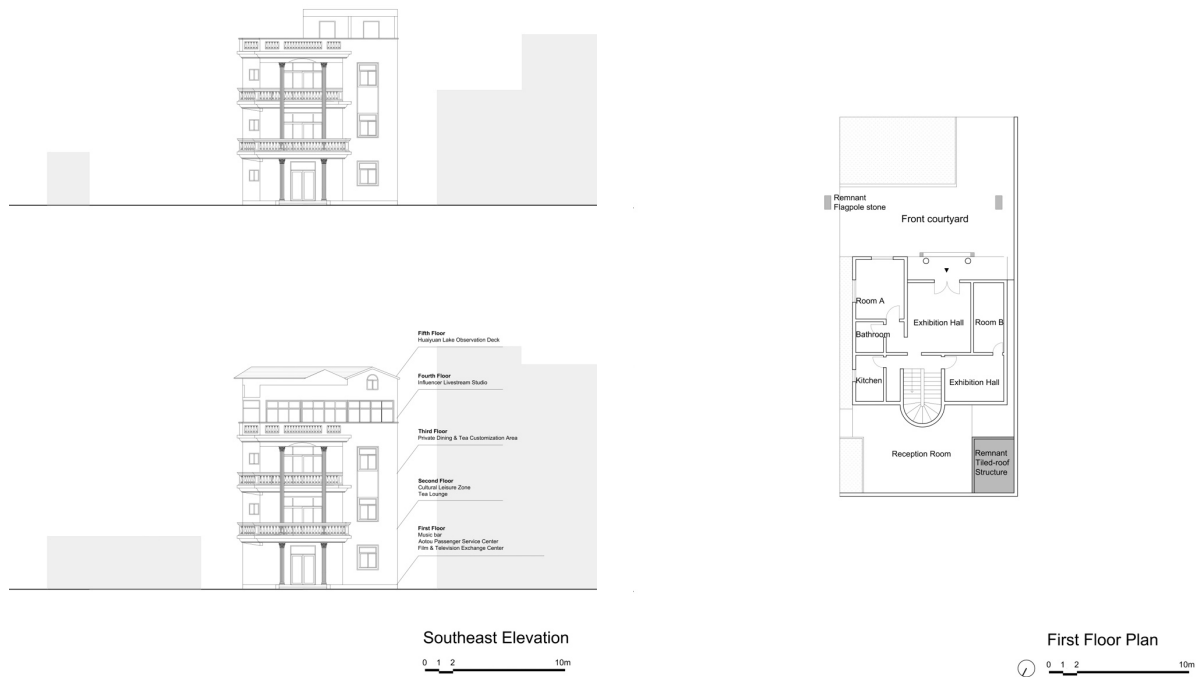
Elevation drawings of Building 34-1, before and after renovation. (Source: Author, 2025).
